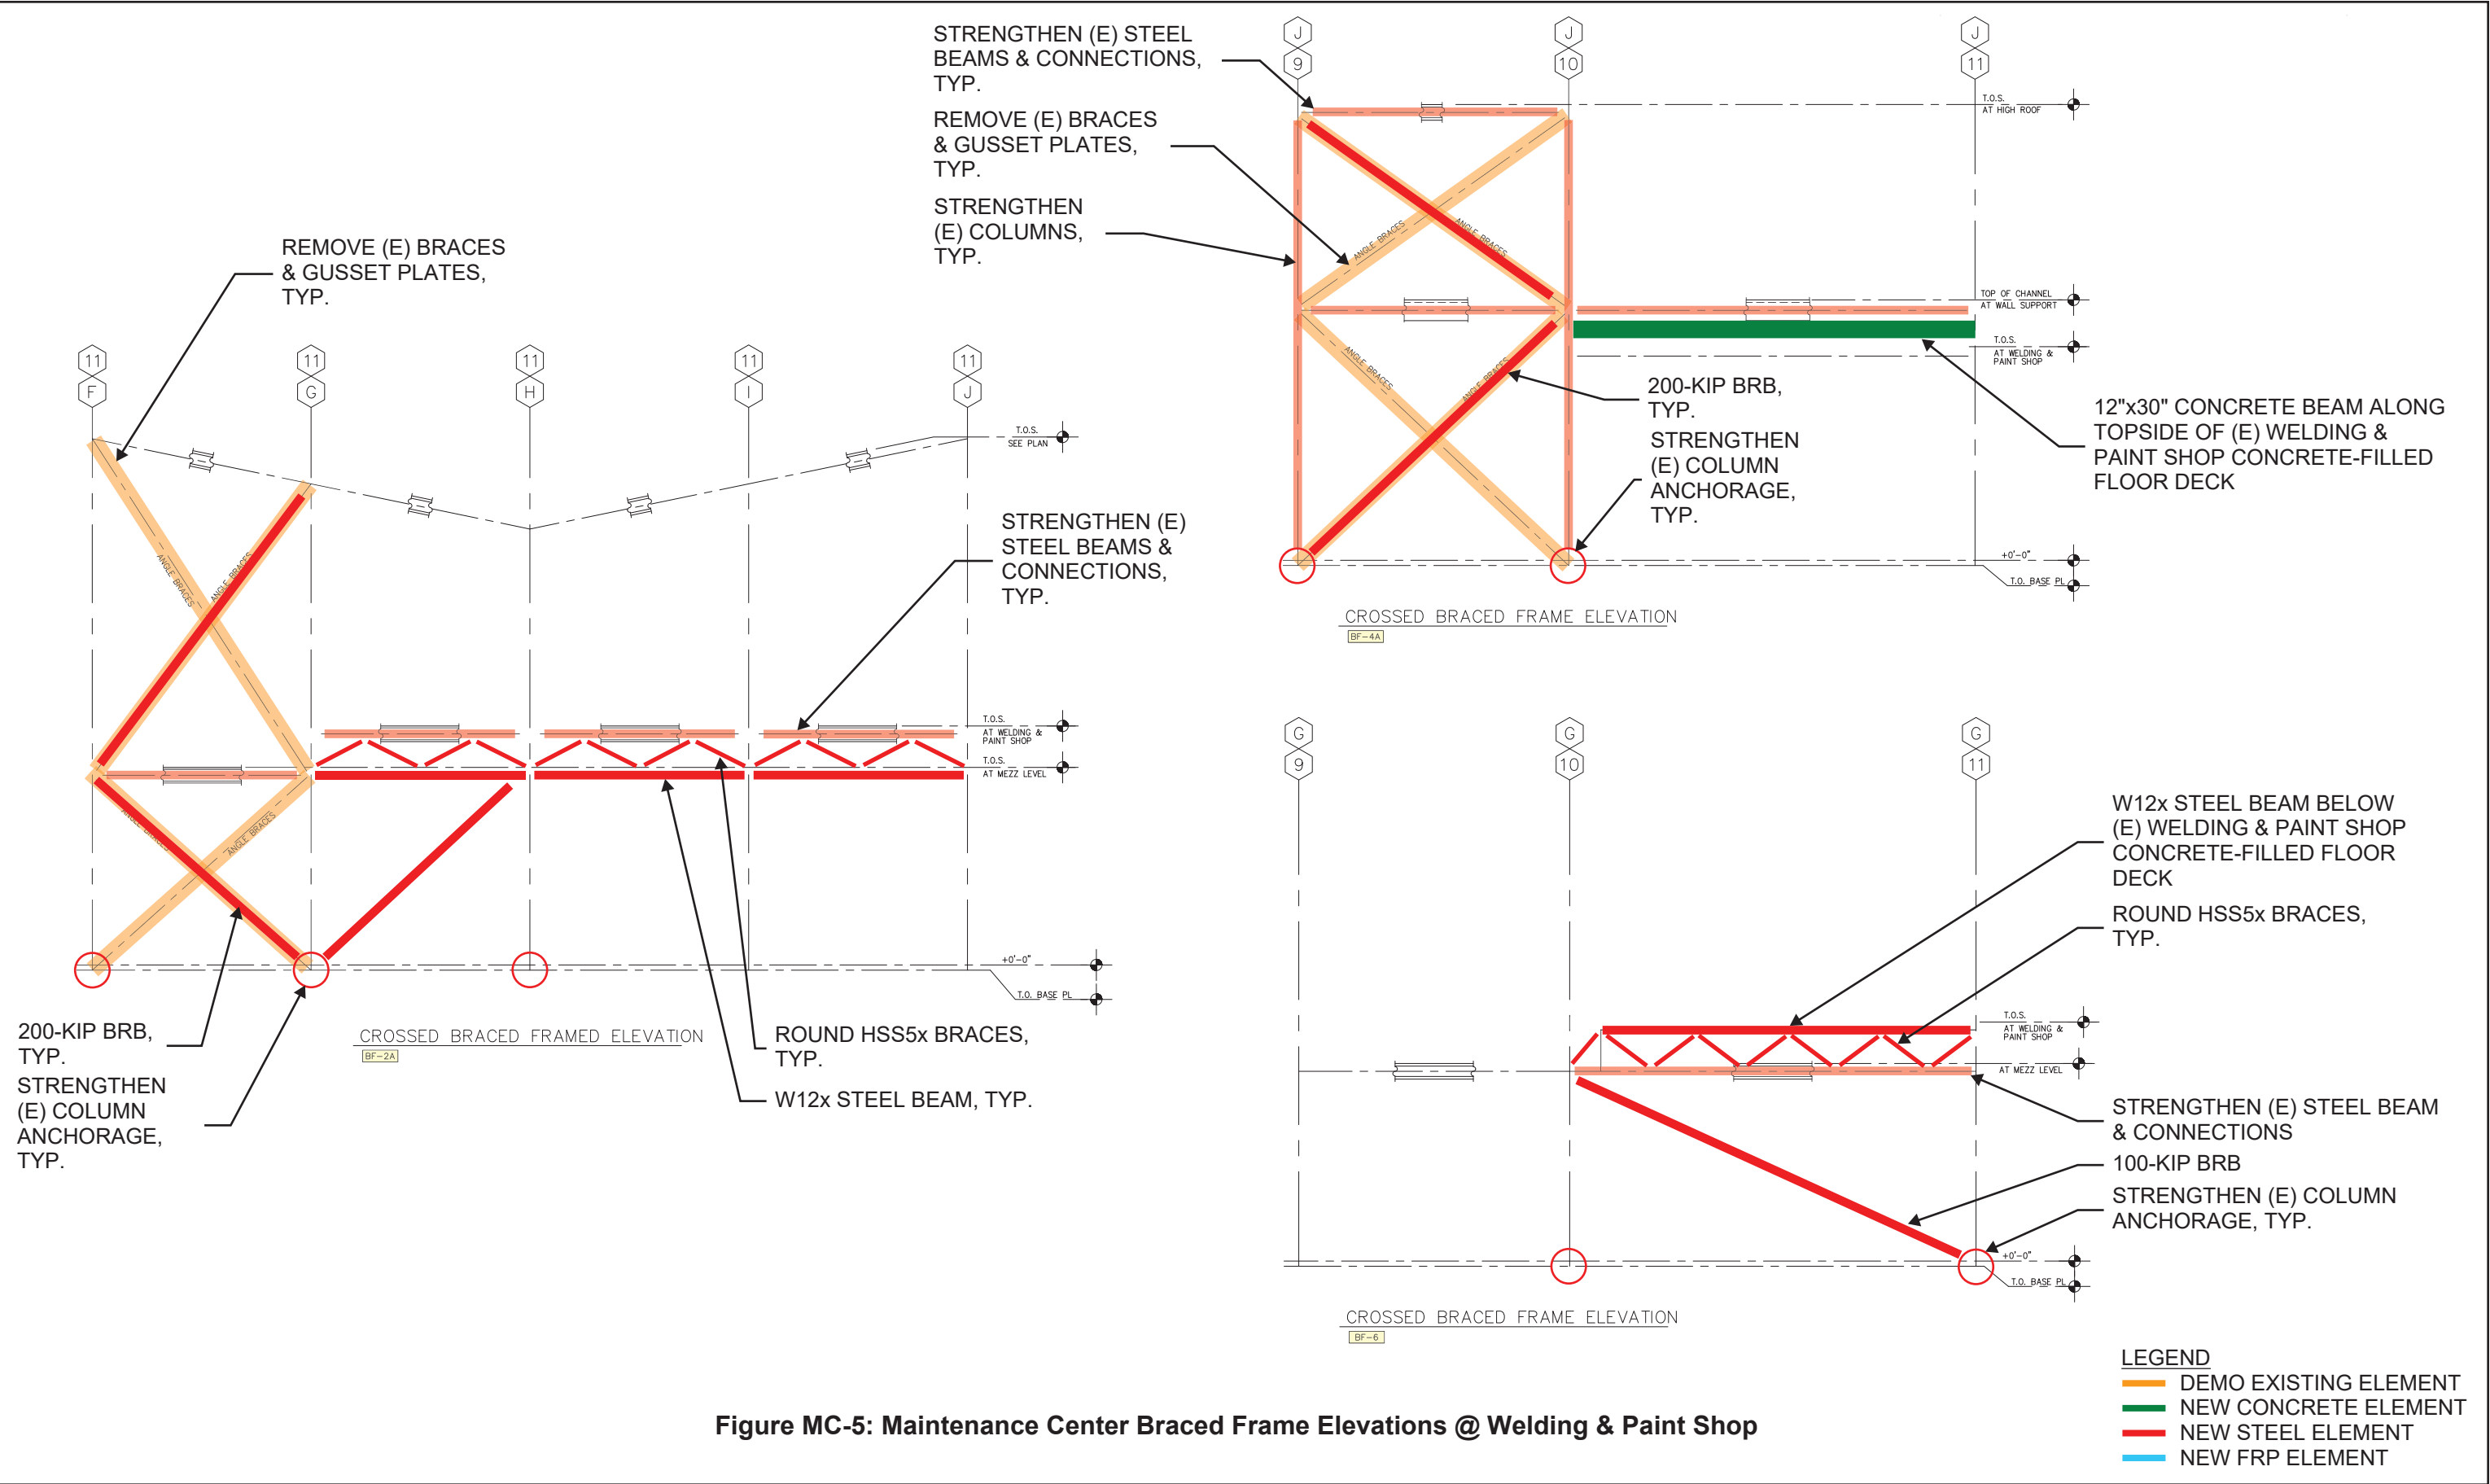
Maintenance Center Braced Frame Elevations @ Welding & Paint Shop
